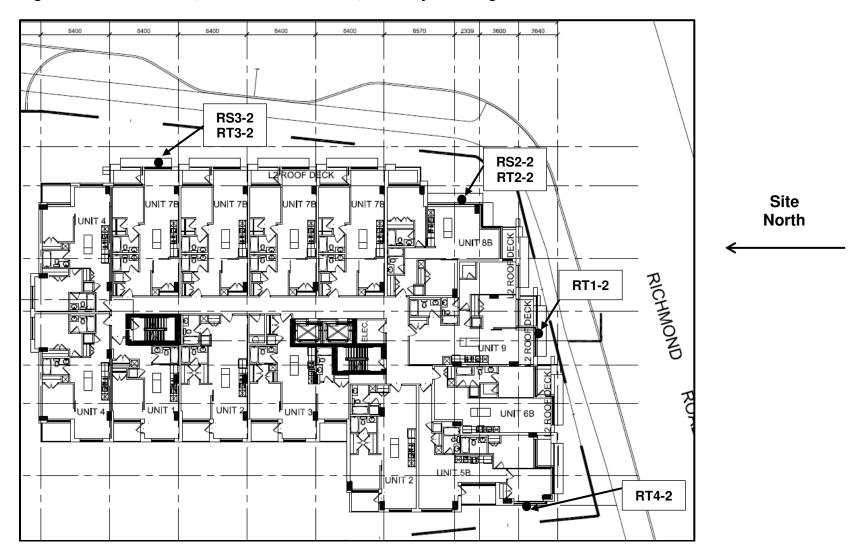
6th Floor Plan, 175 Richmond Road, 9-storey Building
